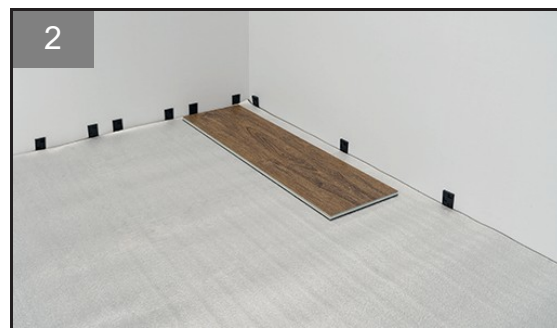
Begin by cutting plank 1 in half. Position the cut end of plank 1 against the wall in the left corner of the room.
